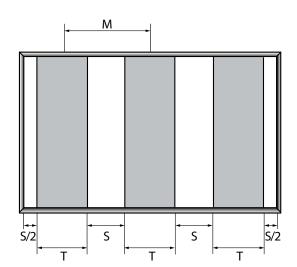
Dimensional sketch of CANTO splitter set and arrangement of multiple splitters
